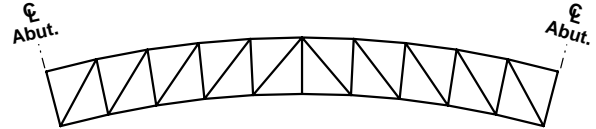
Pratt-Type Single-Diagonal Top Lateral Bracing System for Tub Section Member: Plan View.
